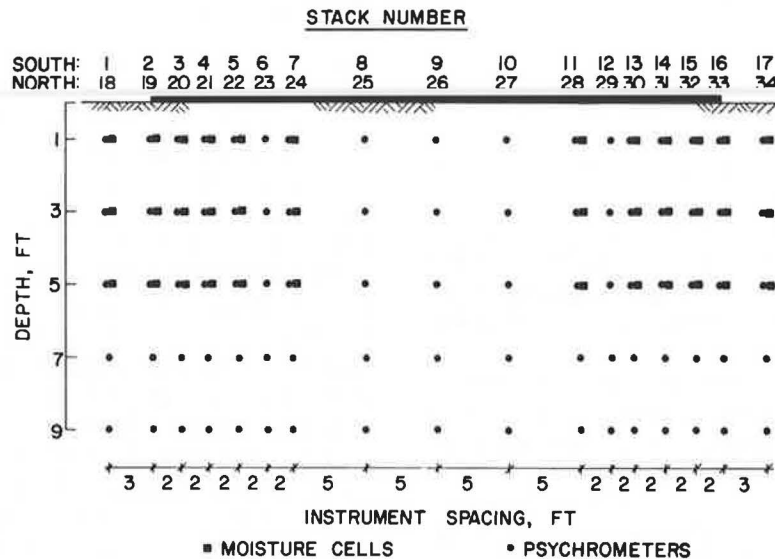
Elevation view of the arrangement and distribution of subsurface instrumentation along either of the lines of borings 1-17 or 18-34.
